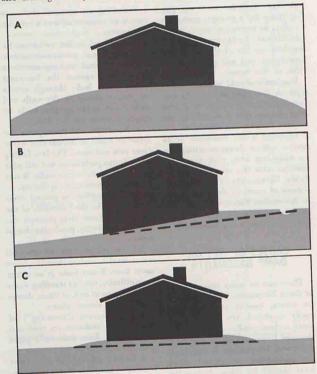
House sites: (A) An elevated site provides good surface drainage away from the house in all directions. (B) Drainage can be routed around a sidehillocated house (note drainage ditch on uphill side). (C) On a flat site, the ground around the house must be built up to drain water away from the basement walls. age away from the house in all directions, and the subsurface or ground water will be at the greatest depth.
